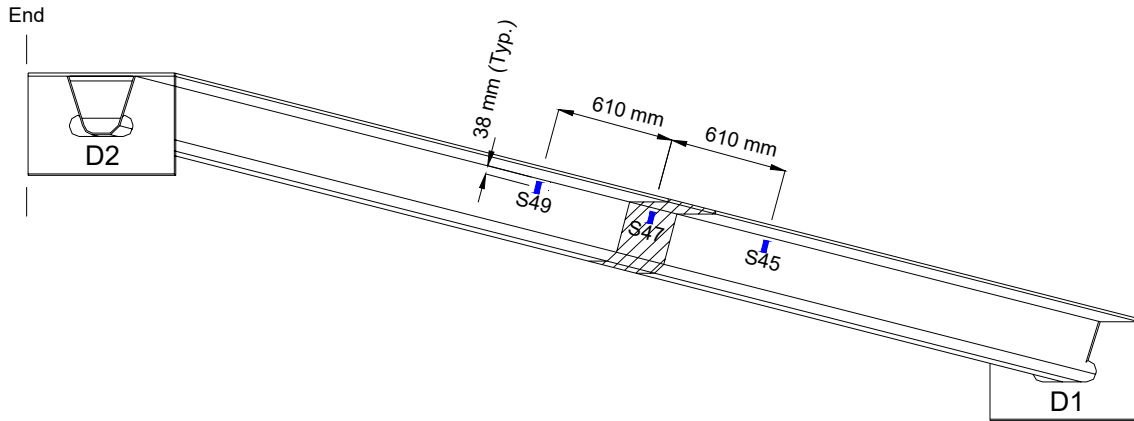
Specimen 2: Strain Gages in Outer Surface of Rib R4 near Rib-to-Deck Welds
